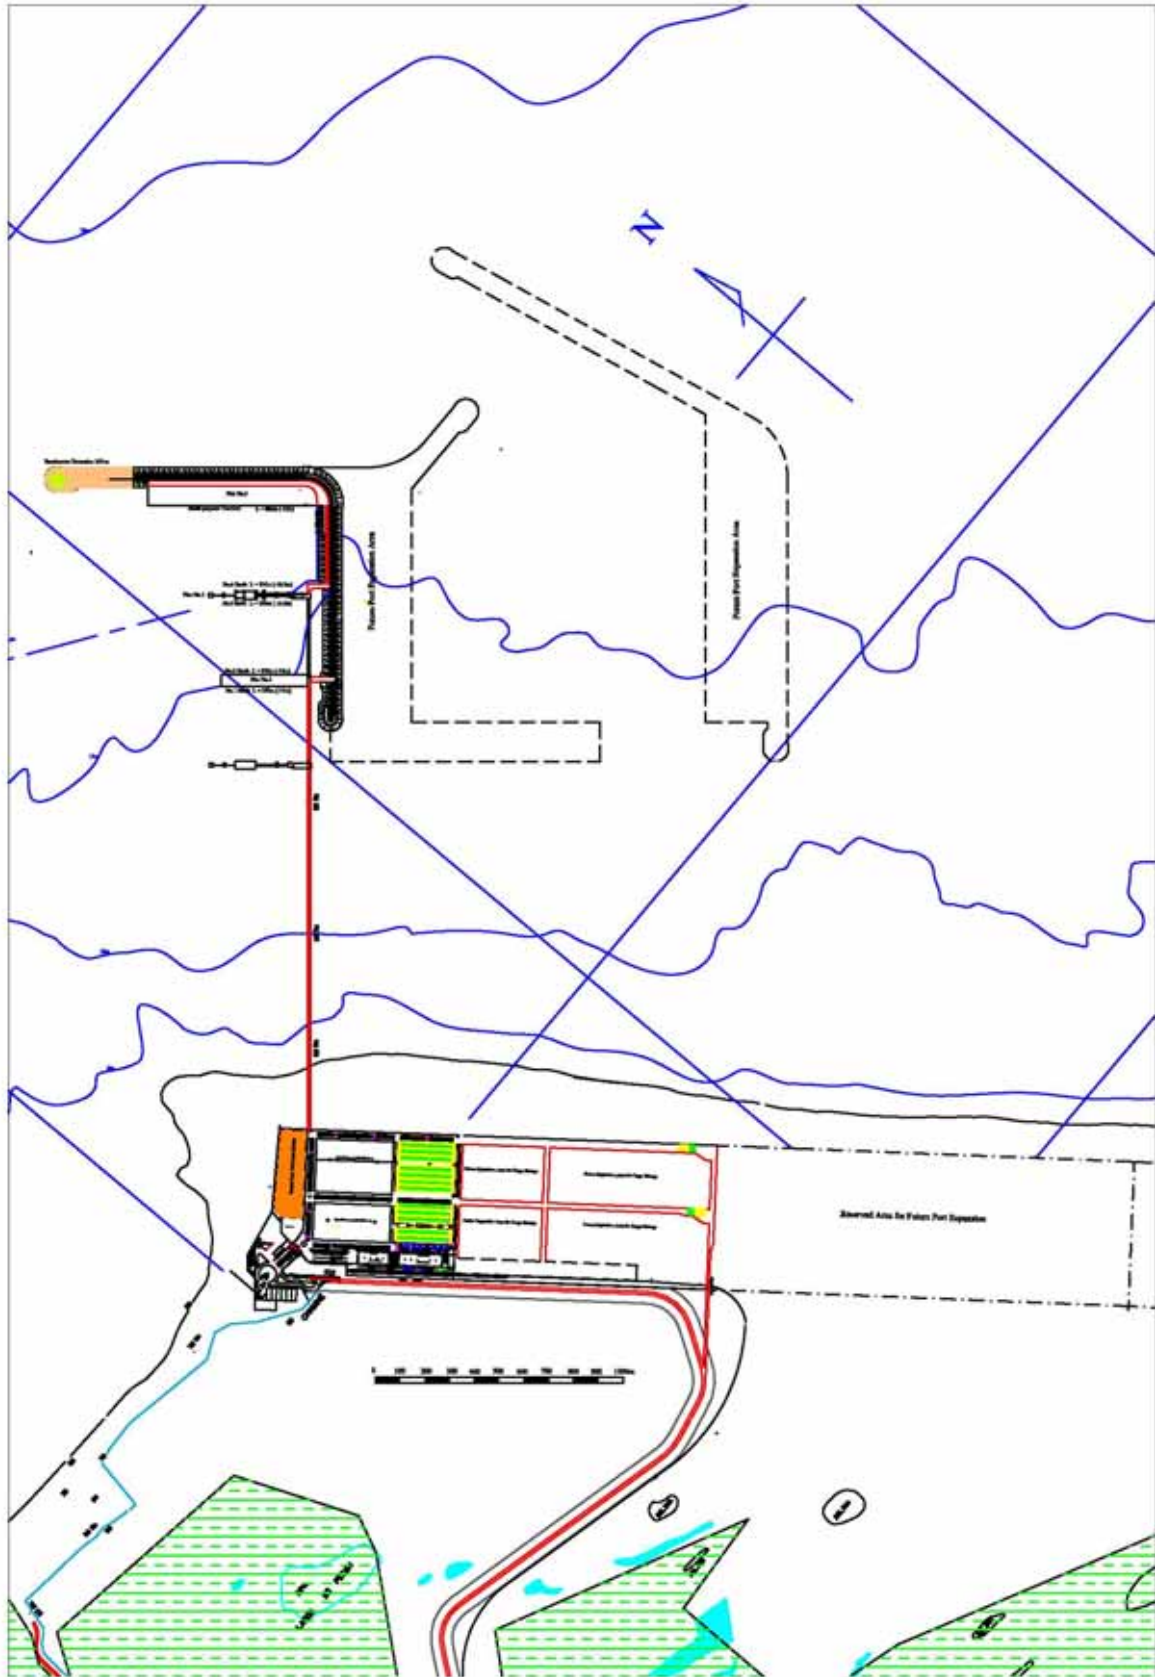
Facility Layout Plan of the Urgent Project
